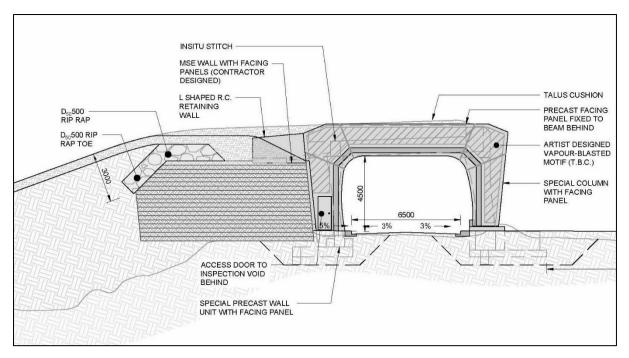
East elevation showing the extent of the foundation footings and the portal design evoking the form of the original avalanche shelter.⁷⁴
